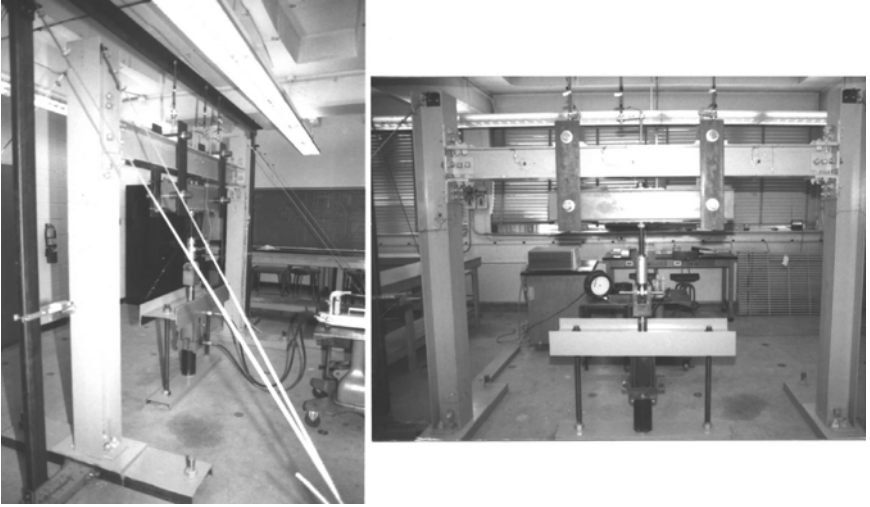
Study on PFRP portal frame with steel-like connection details.
